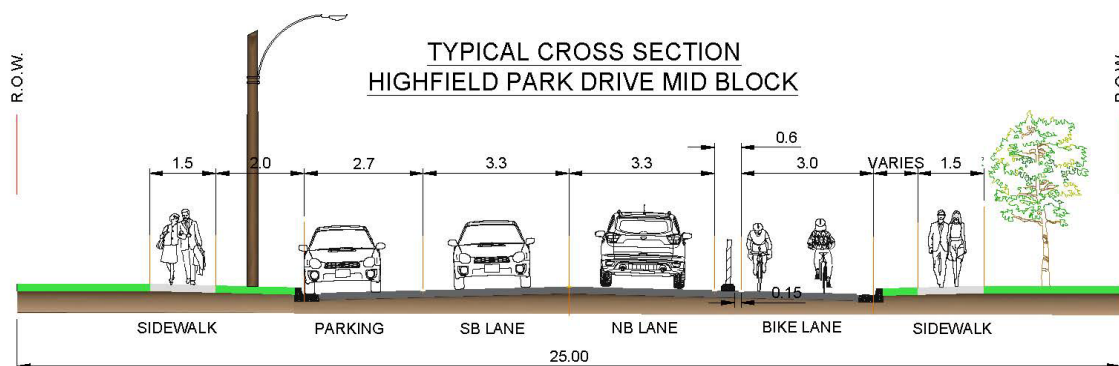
Cross section illustration of proposed Highfield Park Drive bi-directional bike lane
